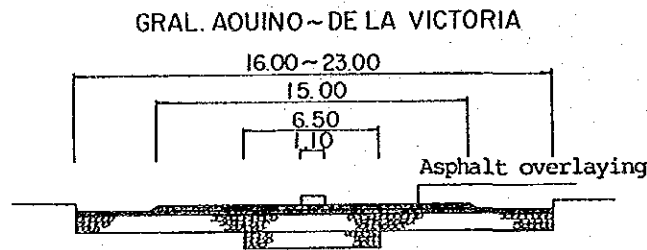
PAVEMENT STATUS OF MME. LYNCH AVENUE
